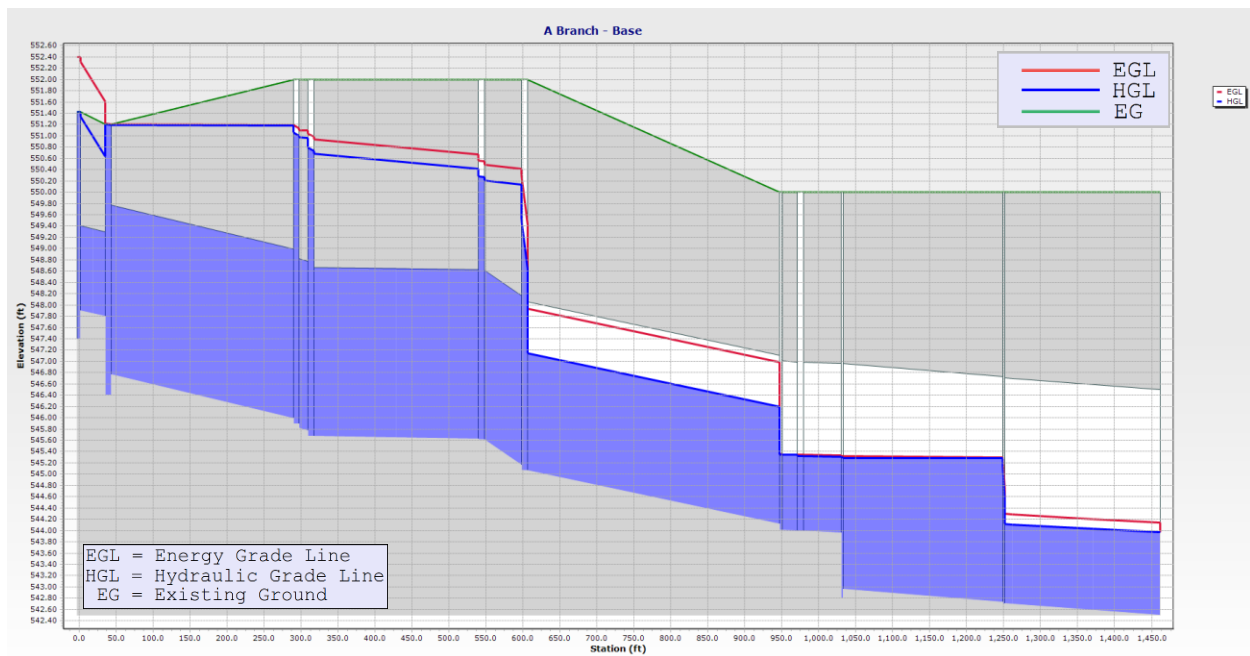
Existing Bowie Street Pipe Profile (25-YR Storm Event)
